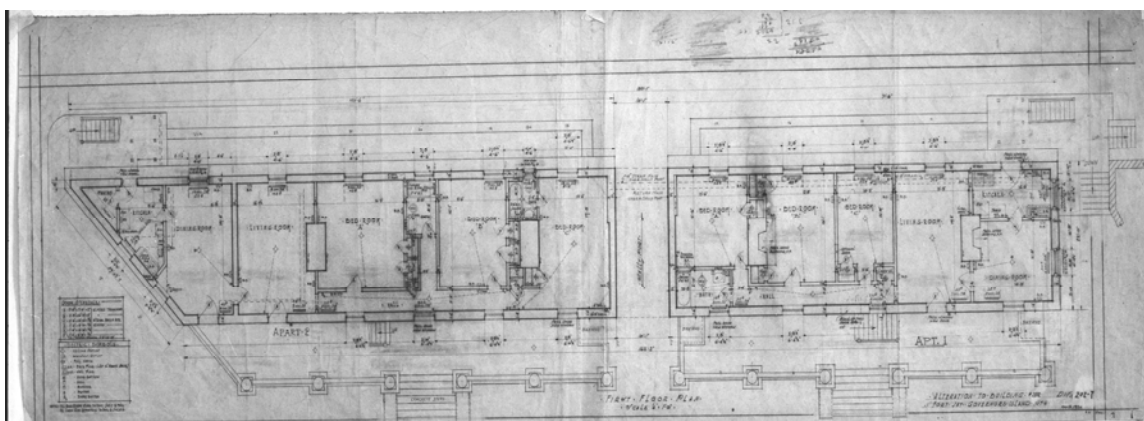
First-floor plan of the east barrack (Building 202), 1934.
